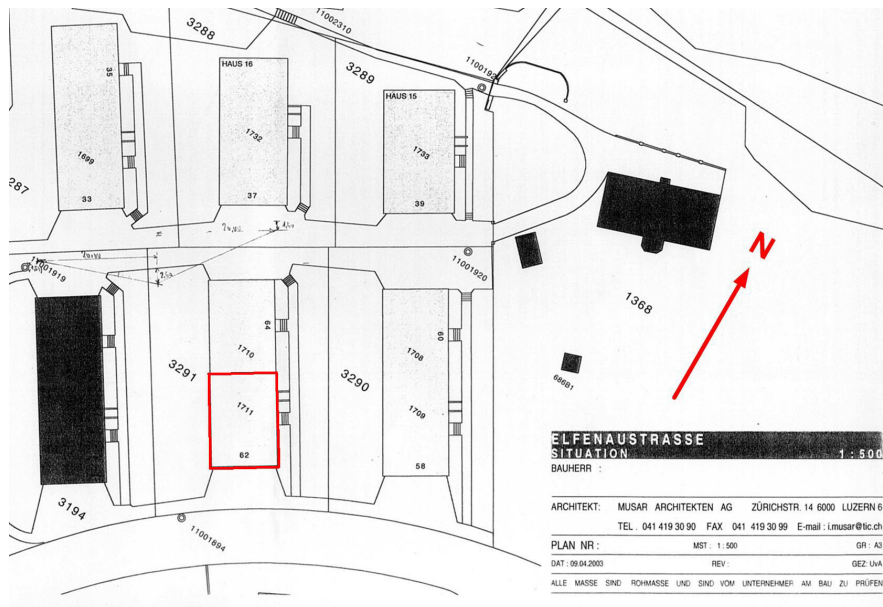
Layout of the surrounding buildings, floor plan of Fig. 5.2 is marked with a red line
